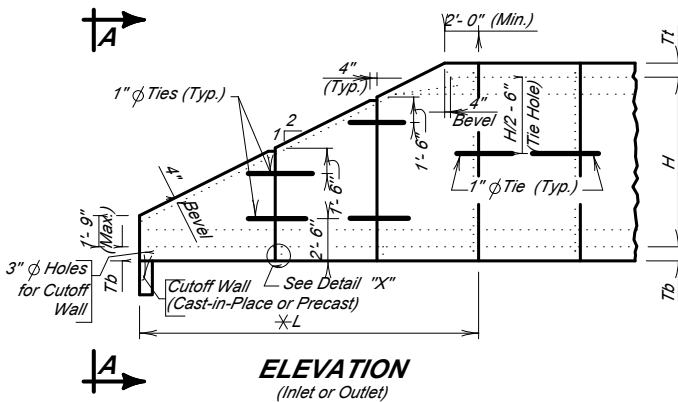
CULVERT-PRECAST BOX SLOPED END SECTION
